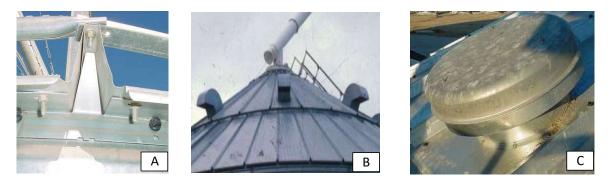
Caulk edge of steel roof ridge plate (A), double bag roof vents (B), fill cap and down spout sealing (C).
